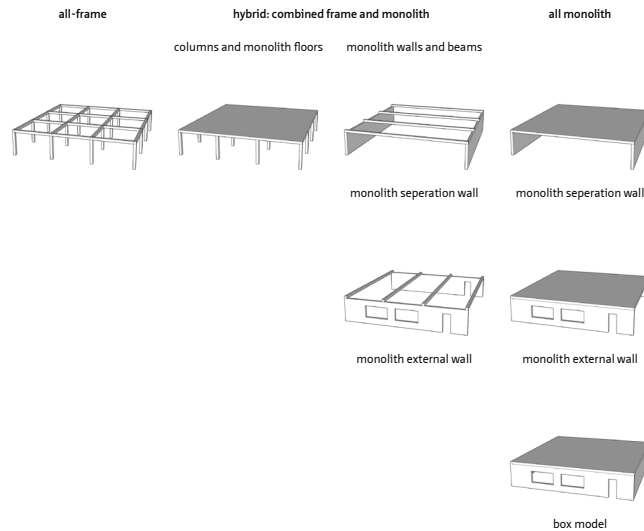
Building structure variation based on frame and monolith elements. A separation wall separates two indoor spaces. An external wall separates the indoor environment from the outdoor environment. After Leupen & Mooij (2008).
